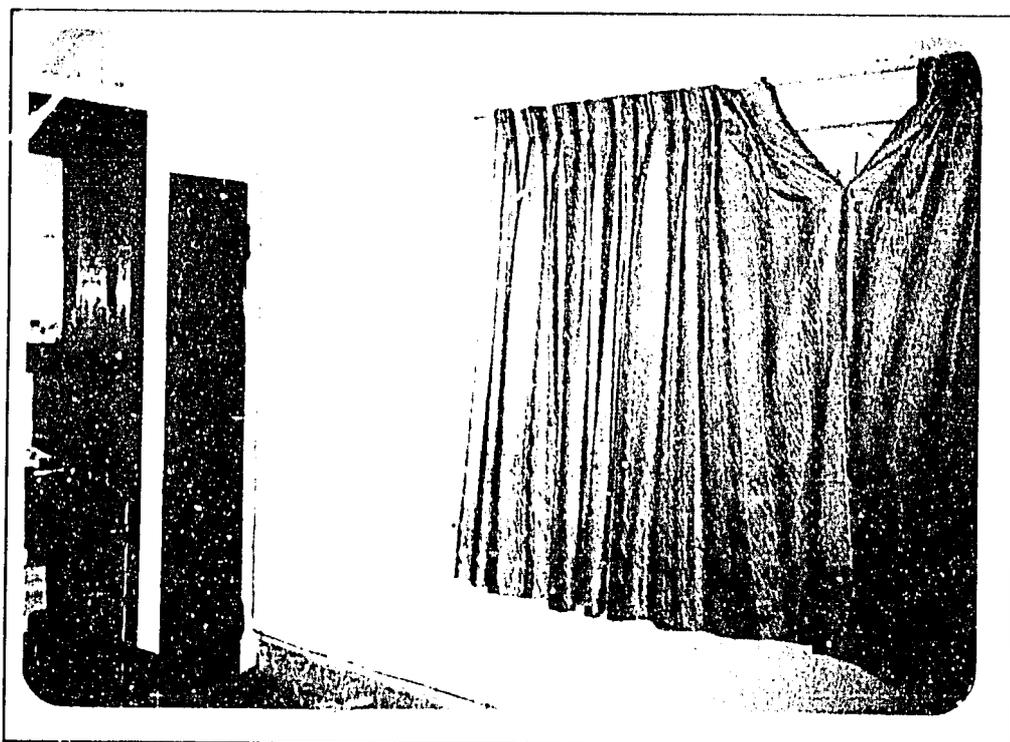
Peshawar DAI Office Facility. Secretary's office, run cable through door frame along wall to small table in corner.
